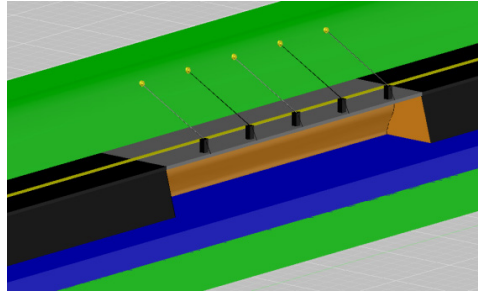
Three-dimensional diagram of pavement slab repair of hanging subgrade
